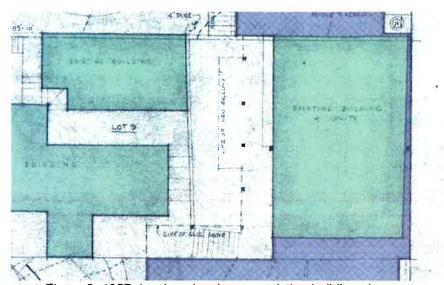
1957 drawing showing pre-existing buildings in green and addition wrapping around in blue. See Attachment A for full drawing sheet.
